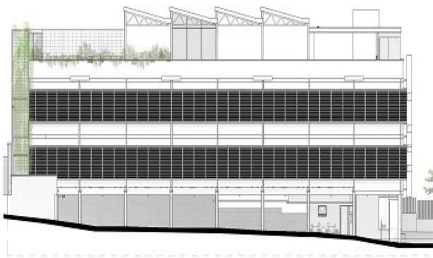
C: 78 Corlett Drive east elevation<sup>65</sup>.
